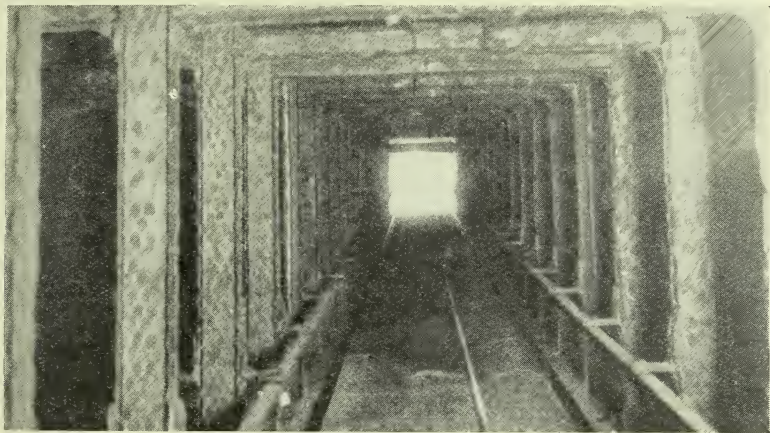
STEEL BEAMS IN MINE SHAFT WRAPPED WITH REINFORCING READY TO BE COATED WITH 'GUNITE.'
